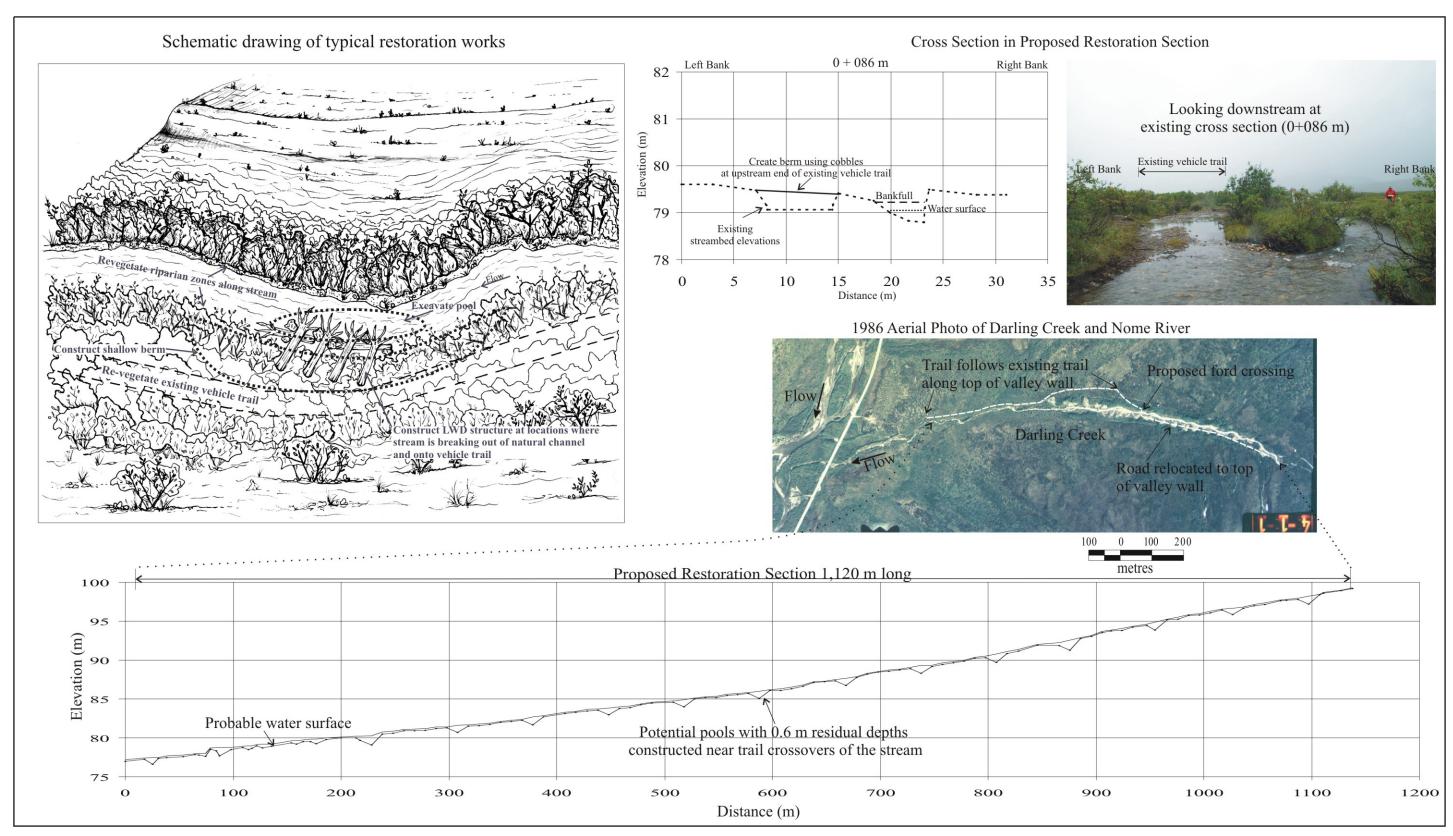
Aerial photo view, cross sections and streambed profile of Darling Creek showing proposed restoration measures.
